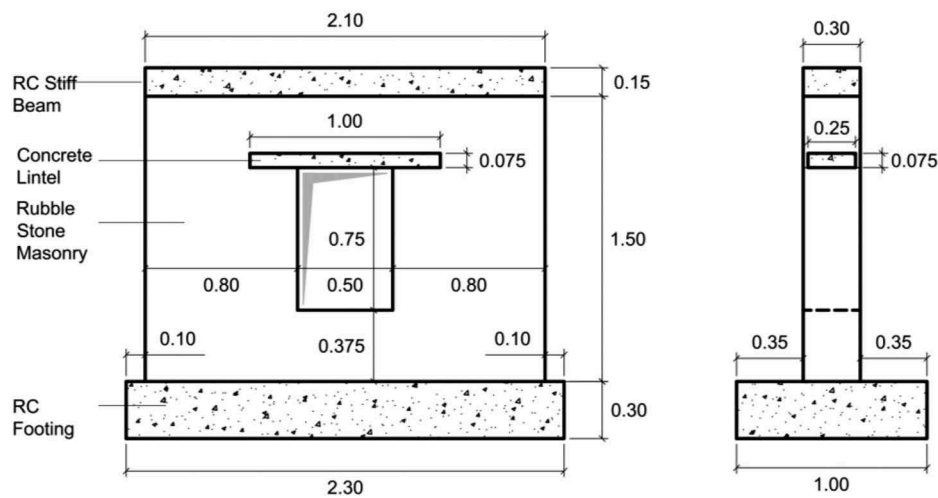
Geometry of the masonry walls specimens (dimensions in m).
